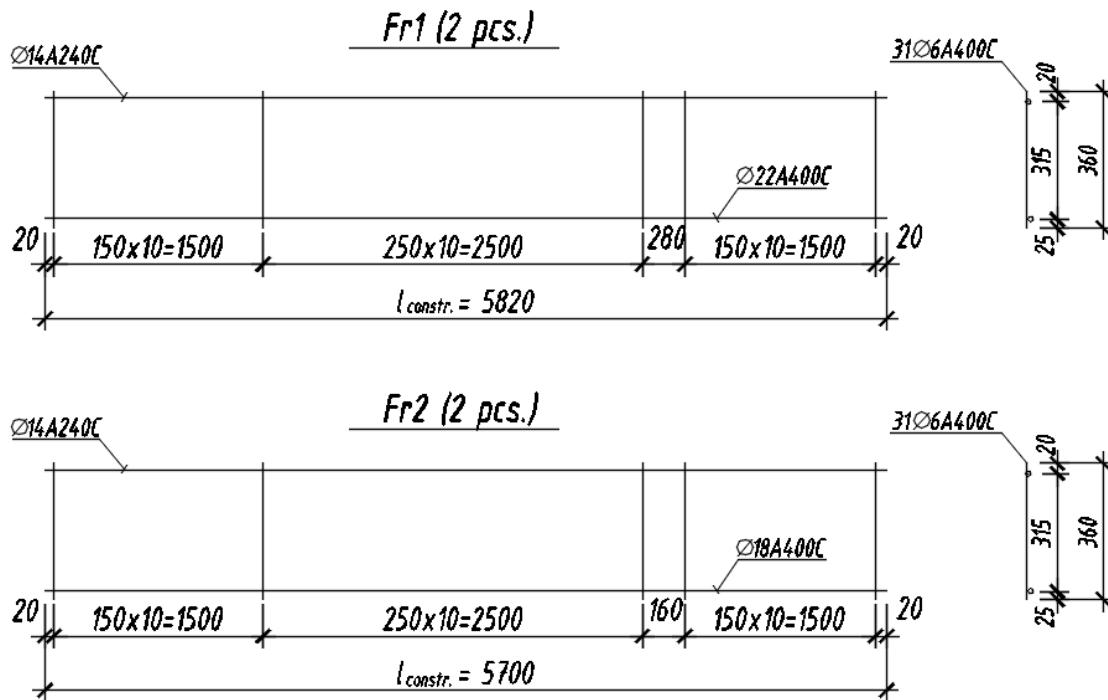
Reinforcement of the secondary beam (continuation)
